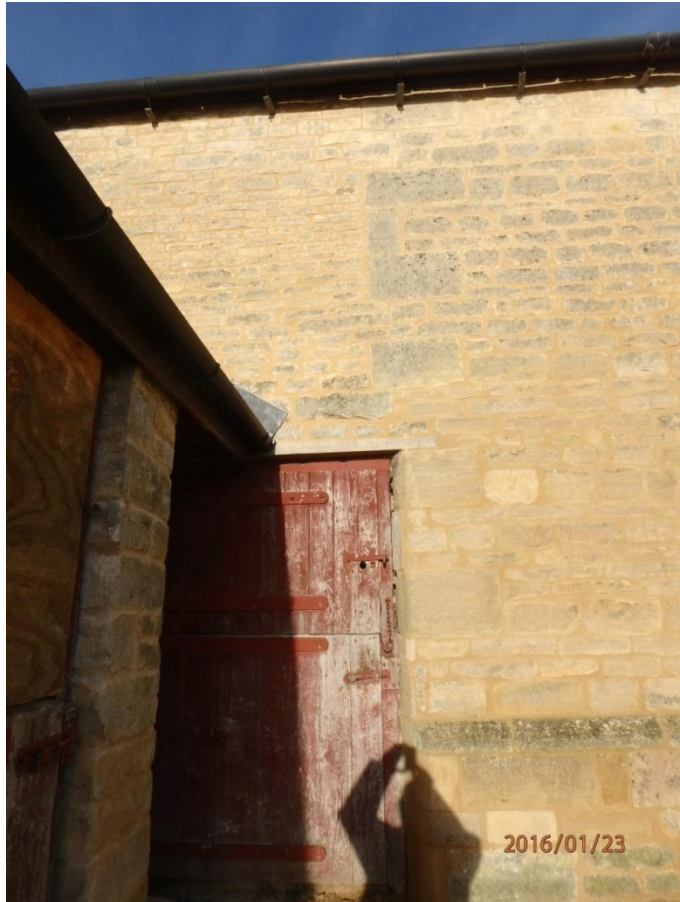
Detail: View of the south facing entrance to the South Elevation, from the south
